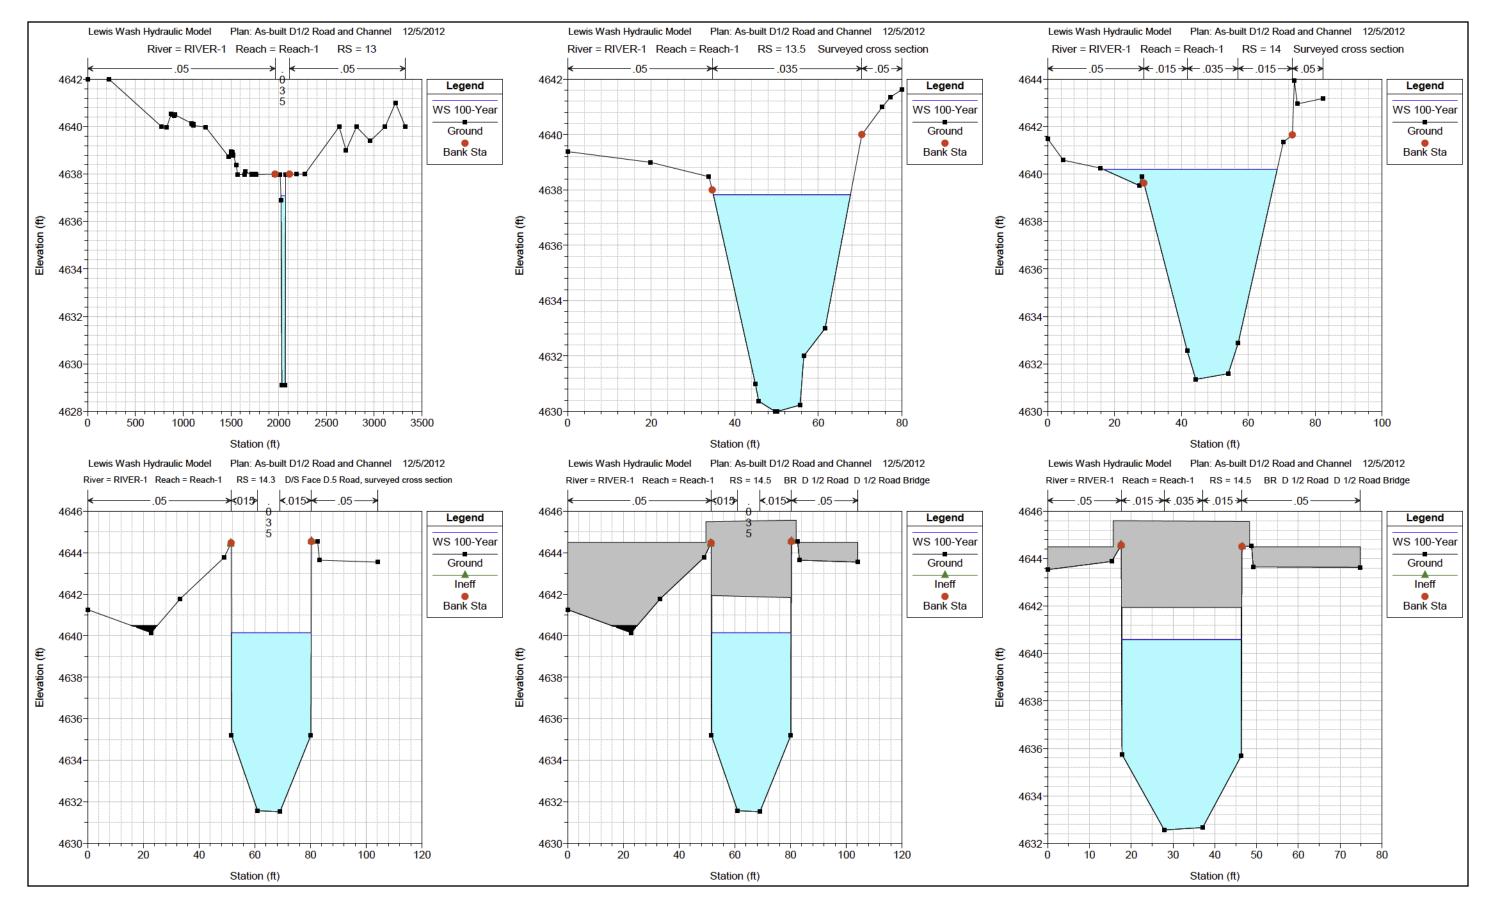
Lewis Wash _ Post-construction Cross Sections D 1/2 Road to E Road
